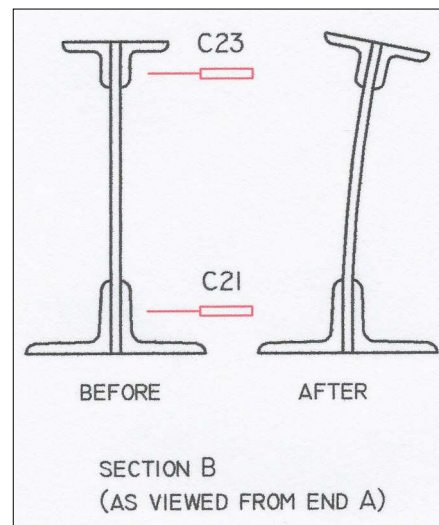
Lateral deflections of Section B, for loading to failure.
